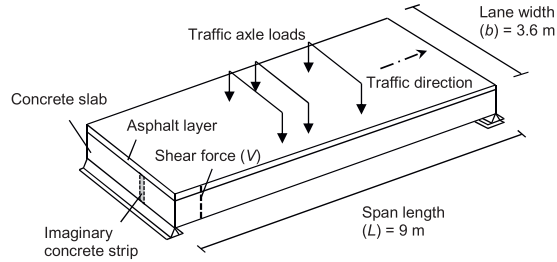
Hypothetical reinforced concrete slab used as a case study [9].
